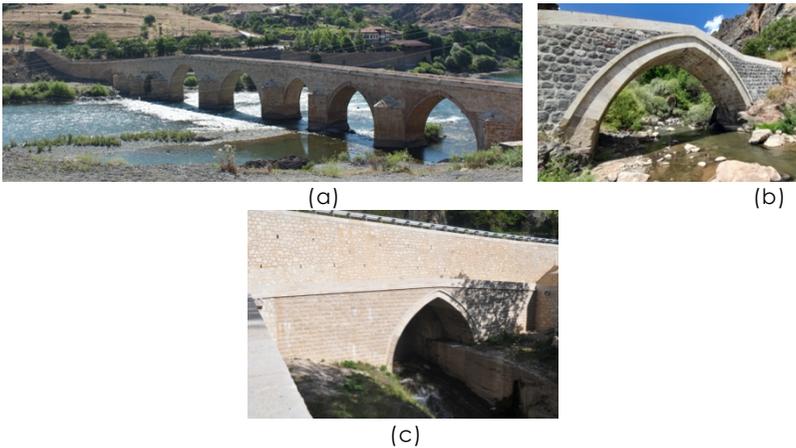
Bridges restored in the Upper Euphrates Section, Elazığ-Palu Bridge (a), Tunceli-Pülümür Hanım Bridge (b), Malatya-Arapgir Small Bazaar Bridge (c) (Authors archive, 2023)
